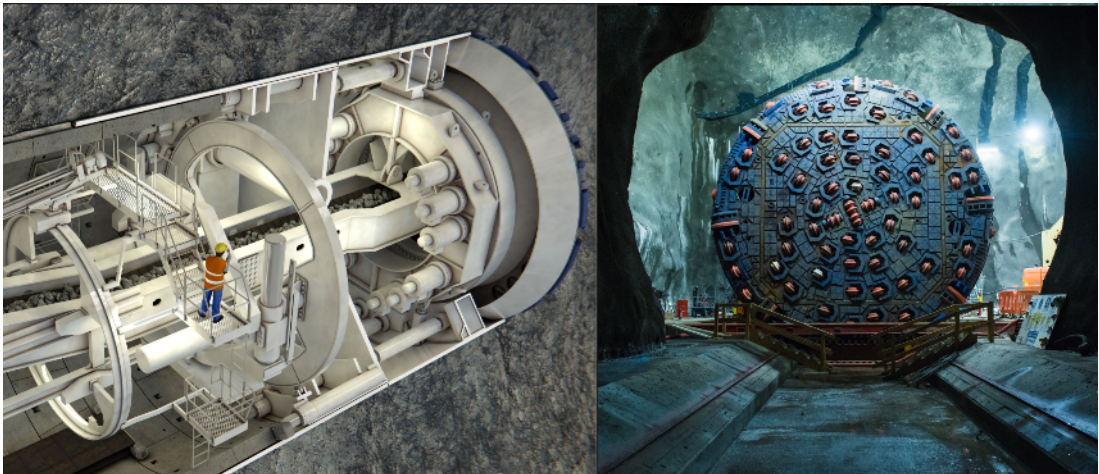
Tunnel boring machine. Right: Cutter head with disc cutters. Left: Behind cutter head, spoil being transported out on a conveyor belt. The photos are press photos from the Follo line project (Bane NOR 2018)
